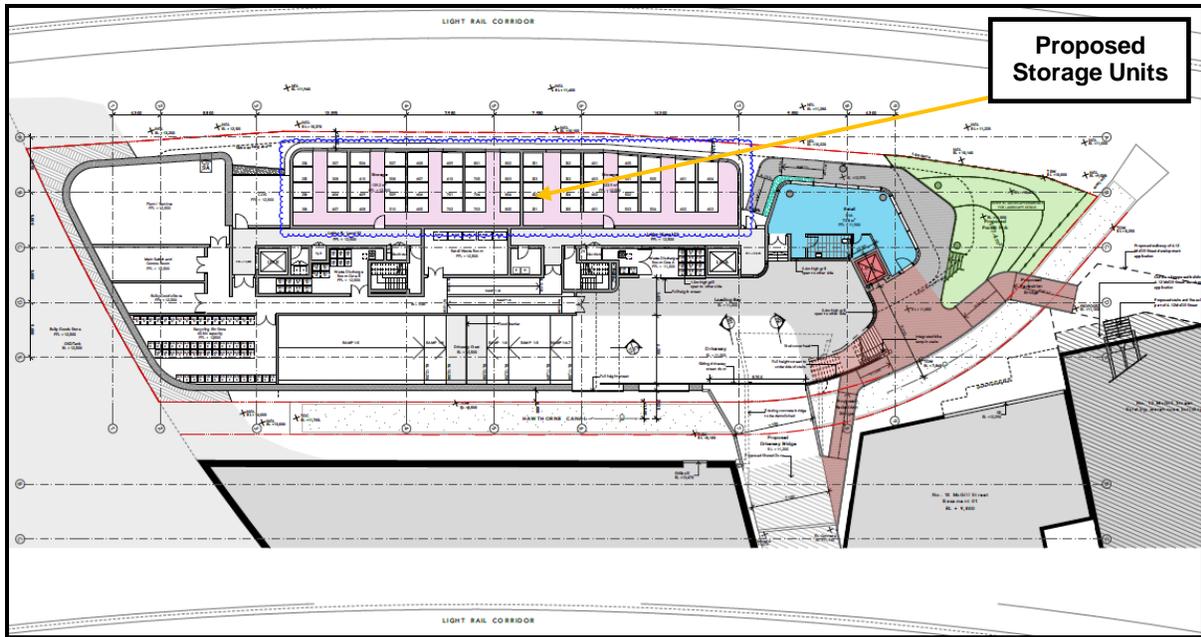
Excerpt Level 1 Floor Plan illustrating apartments subject to the PMF deleted and replaced with individual storage units
